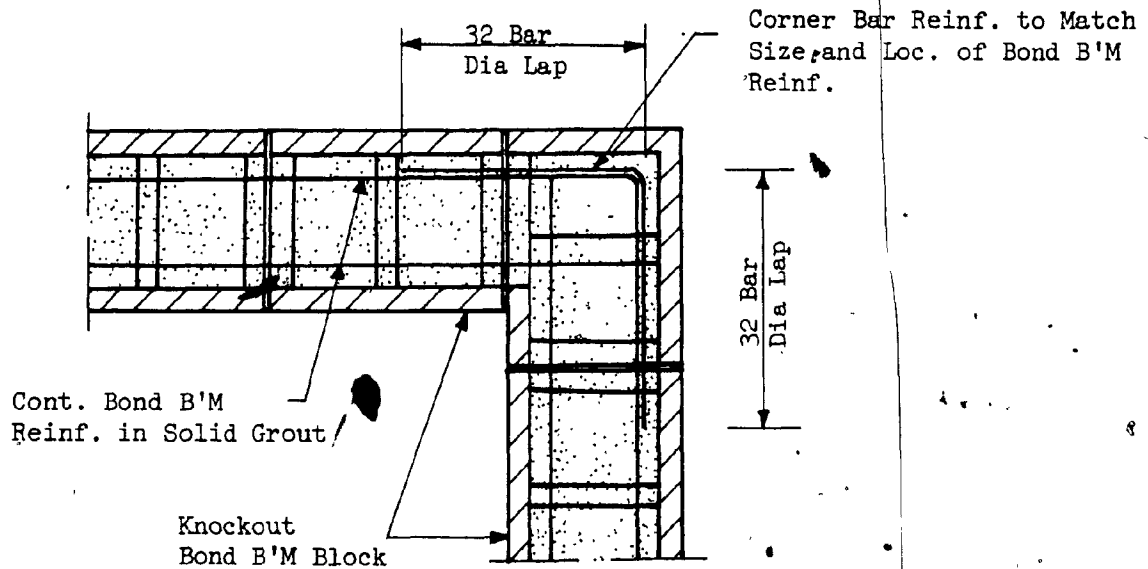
Typical Bond Beam Reinforcement at Corners.
